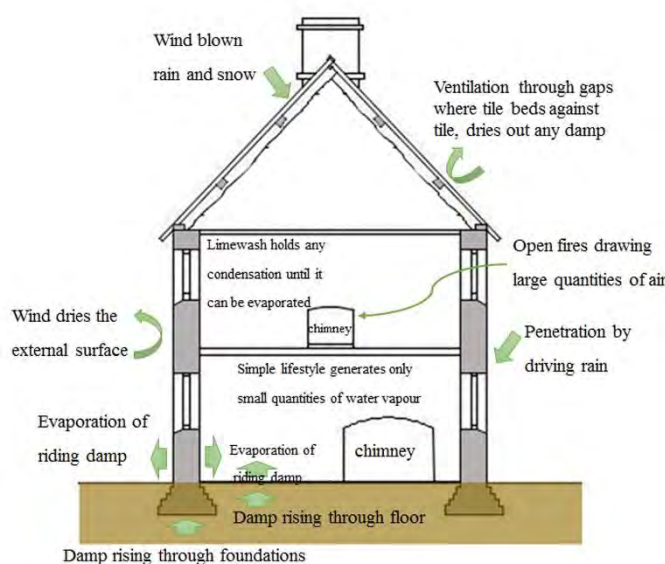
Moistures movement through the air and structure. Source: *Guide to building services for historic buildings* (182) in own elaboration.
